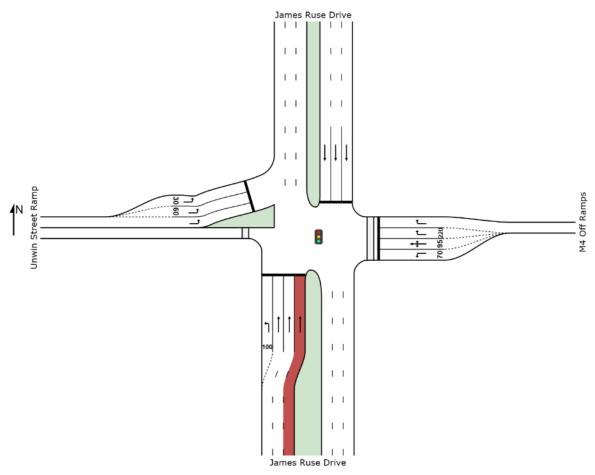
Intersection of James Ruse Drive M4 Ramps and Unwin Street Ramp (Note – Geometry with WestConnex to be checked)
